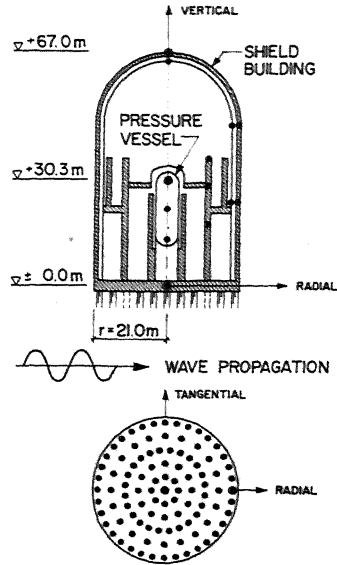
Dynamic Model of Reactor Building, Elevation and Plan View with Location of Piles
